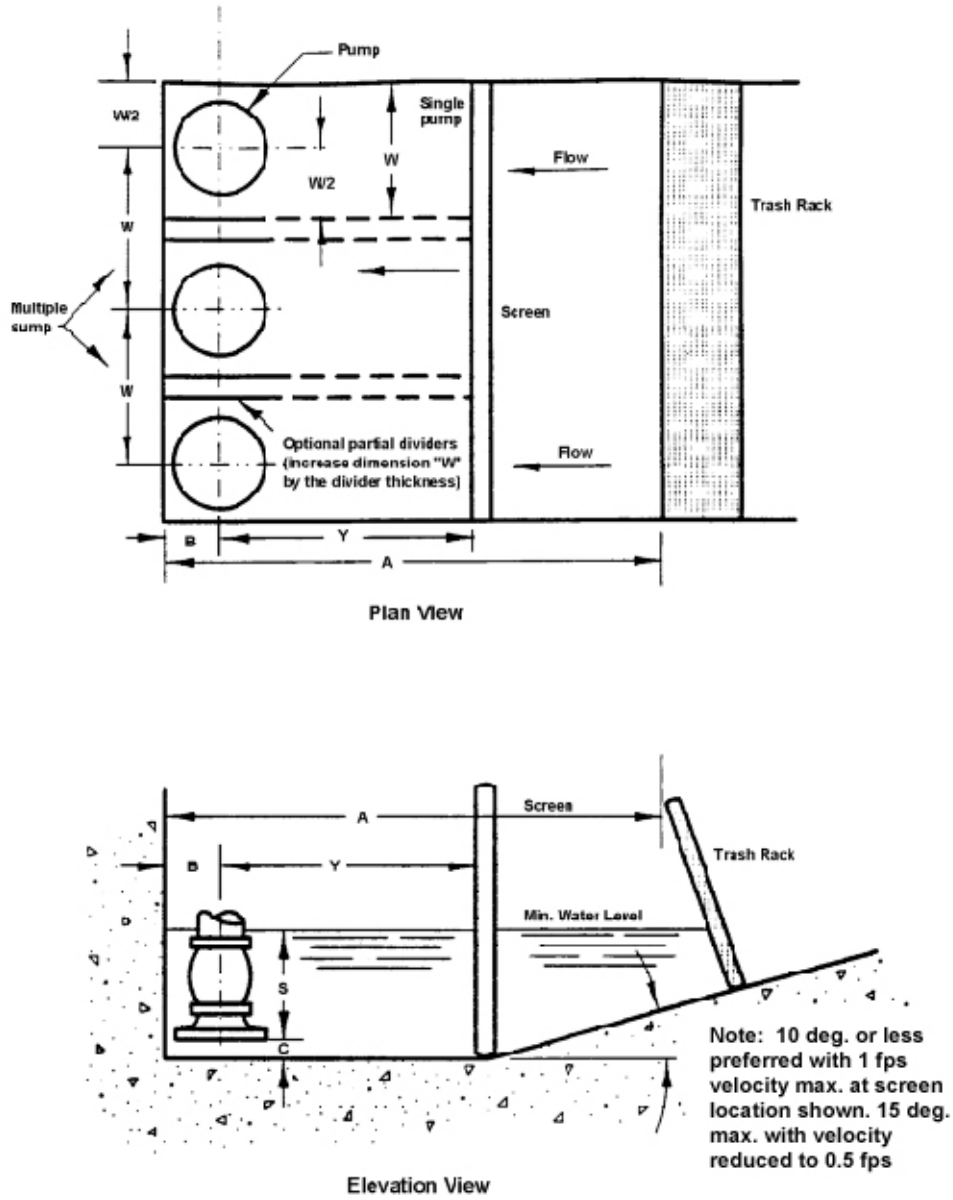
B-2 Wet Pit Dimensions, Plan, and Elevation View, Wet-Pit Type Pumps
